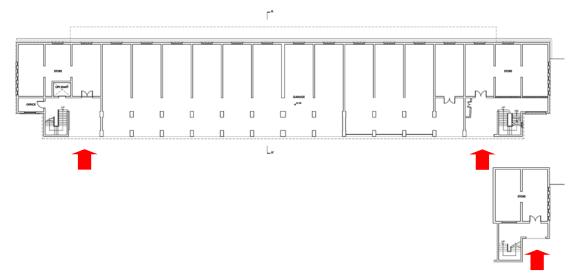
Ground floor and lower ground floor plan of Block A of the former Police Married Quarters.
